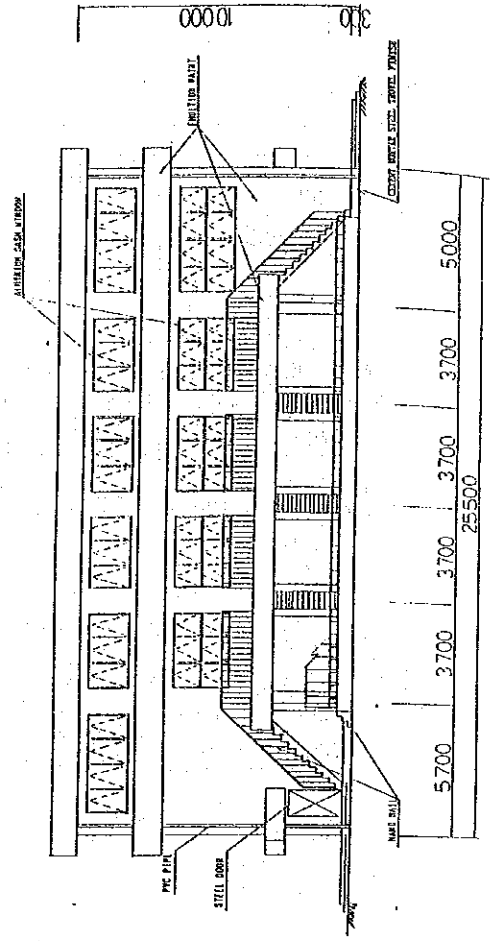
SECTION OF SEWER TRANSFER PUMP STATION NO.5 (B)
